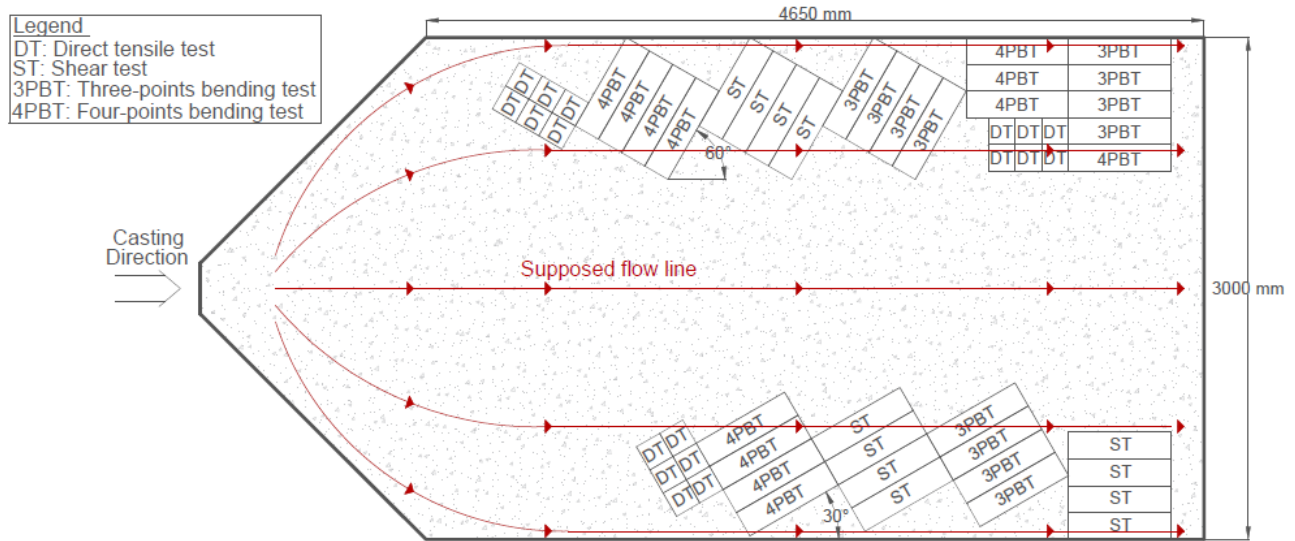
Slab plan view, supposed flow lines and specimen locations
